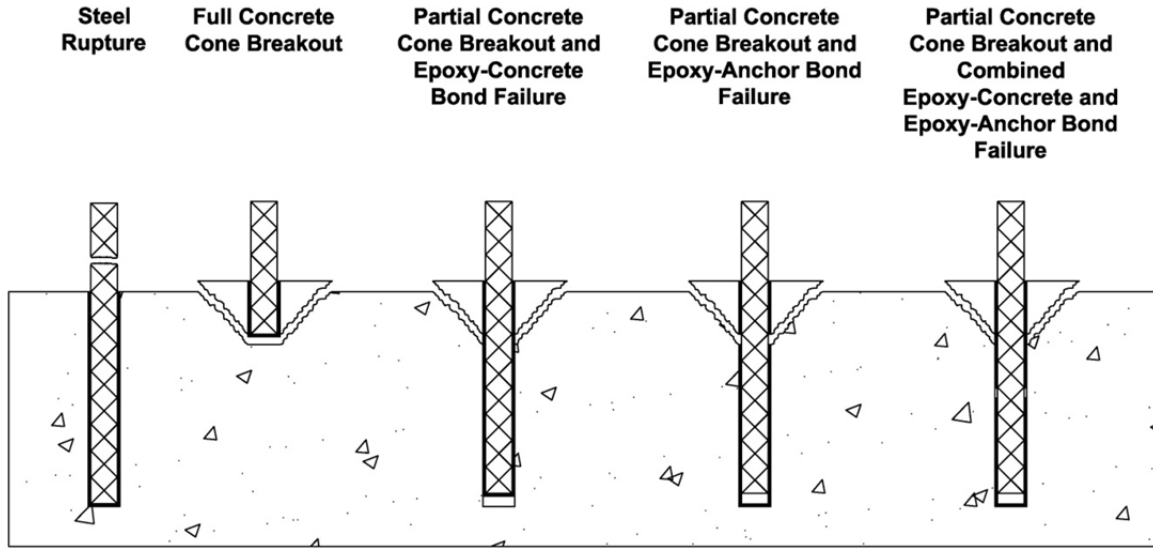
Failure Modes for Epoxy Anchors Loaded in Tension
